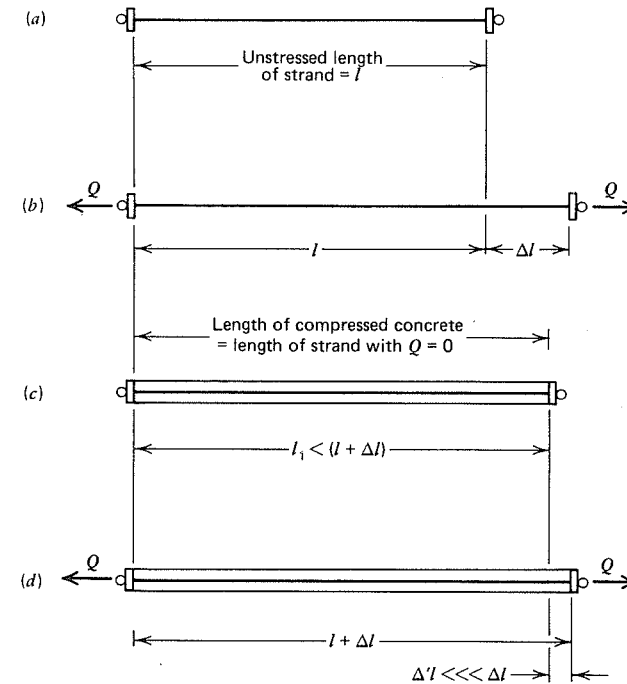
Use of prestressed concrete to limit tensile deformation.
